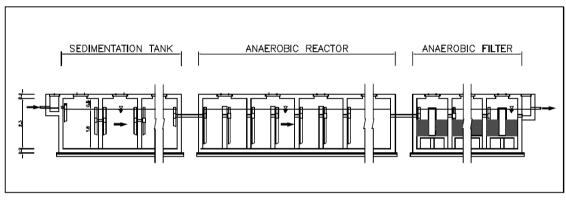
Typical Cross Section of WTP (Anaerobic Treatment Plant)
